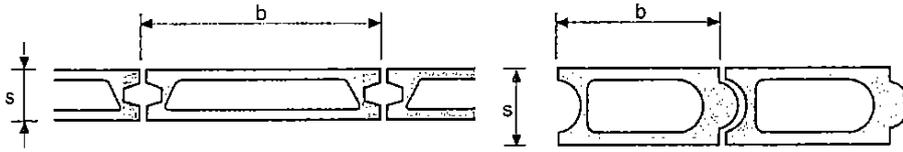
example of the shape of the precast-concrete sheet pile (9)
